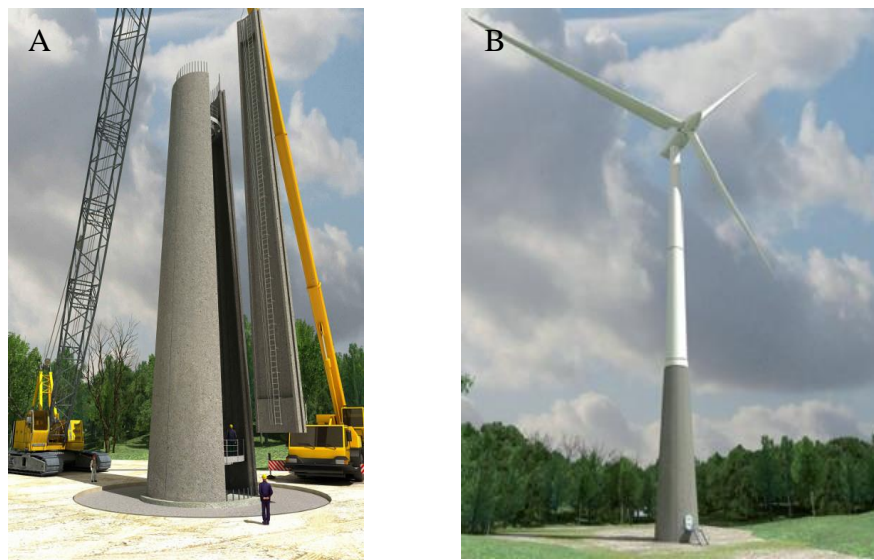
A) Cranes assembling the precast concrete parts B) GRI hybrid concrete-steel wind tower
